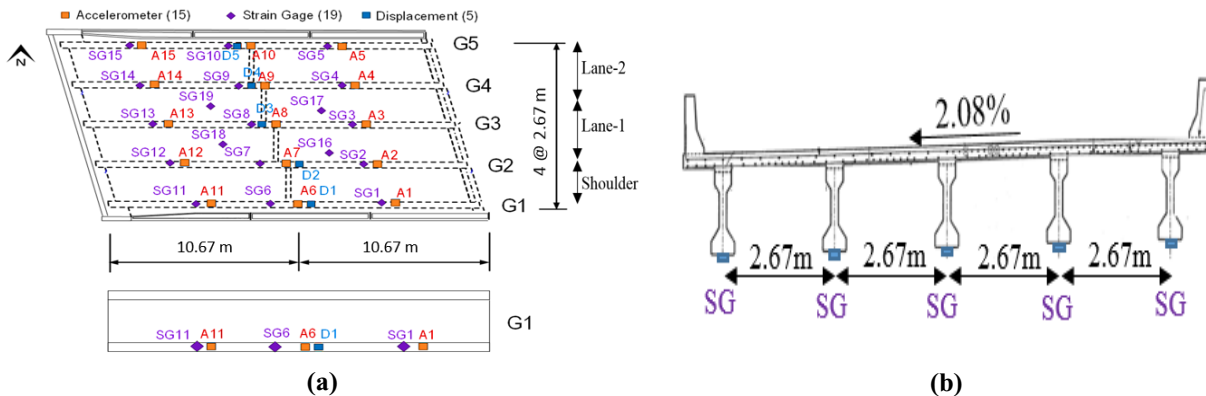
(a) Instrumentation plan on West span and elevation view of girder G1 (b) cross section. (A= accelerometer, SG= strain gage, and D= Displacement).
